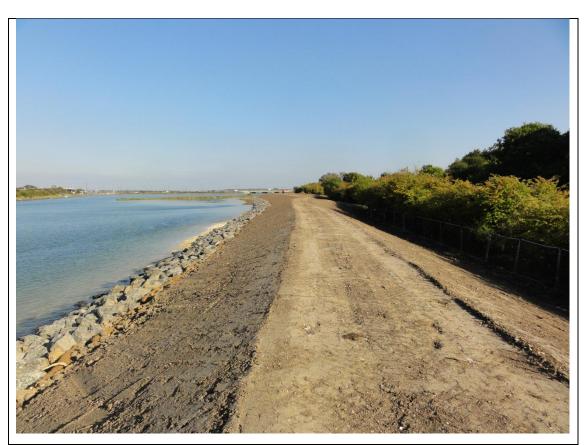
Typical rock revetment construction between Ports Creek Railway Bridge, and the Eastern Road Bridge
